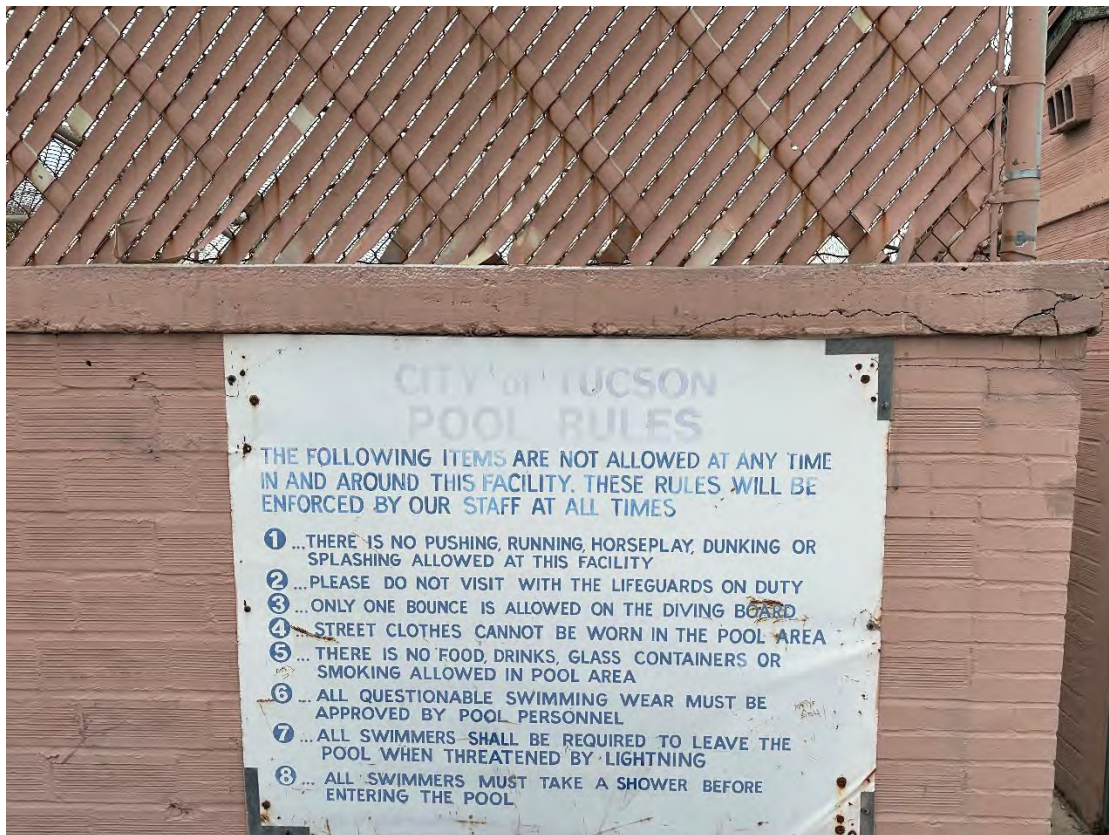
Overview of pool signage on the north elevation of women's bathrooms, view facing south
